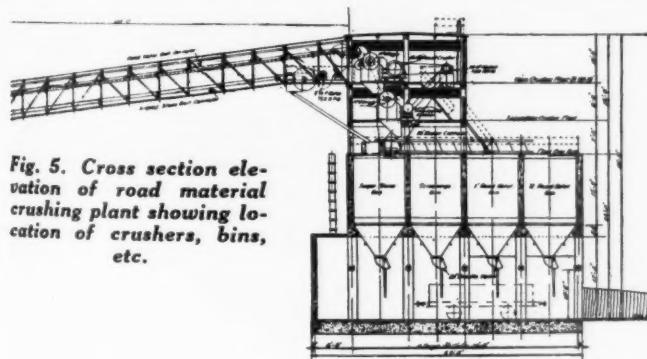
Cross section elevation of road material crushing plant showing location of crushers, bins, etc.
